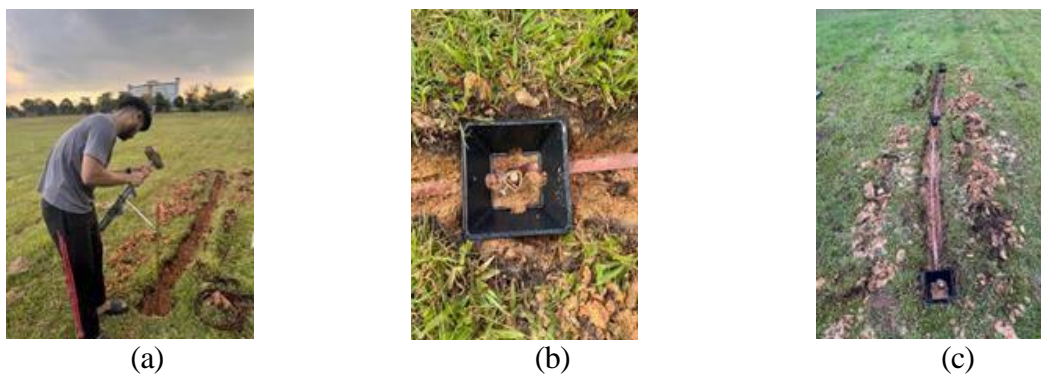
Installation three parallel rod (a) Parallel rod copper, (b) Connecting rod and tape and (c) Parallel 3 rod copper
